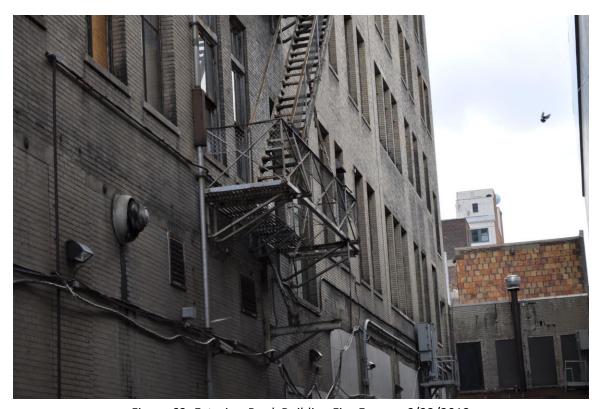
Exterior, Book Building Fire Escape. 6/22/2012
